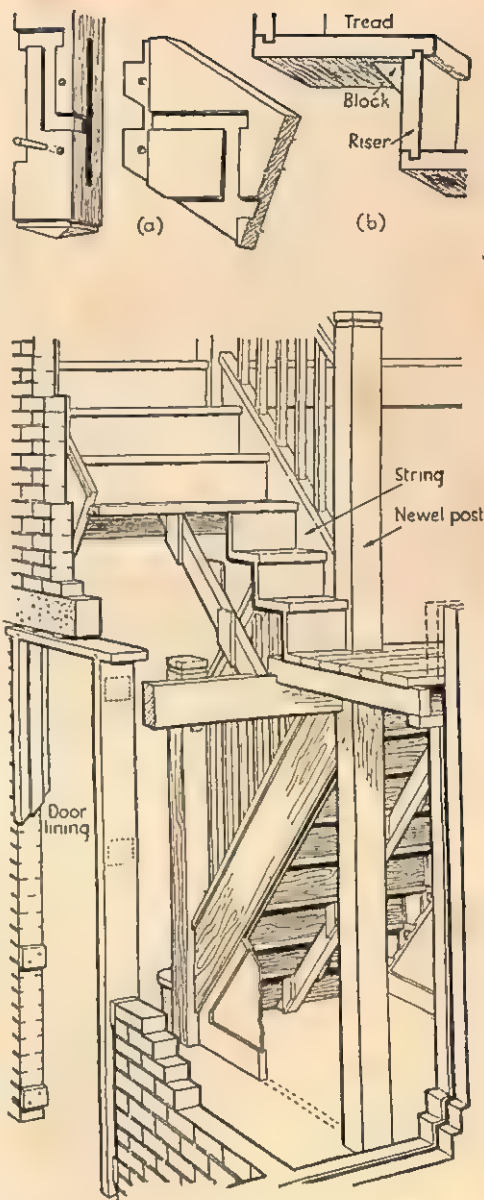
Staircase construction. The cut-away drawing shows lower and upper flights with a landing between. Why are the stairs constructed in the carpenter's shop and not on the site?
